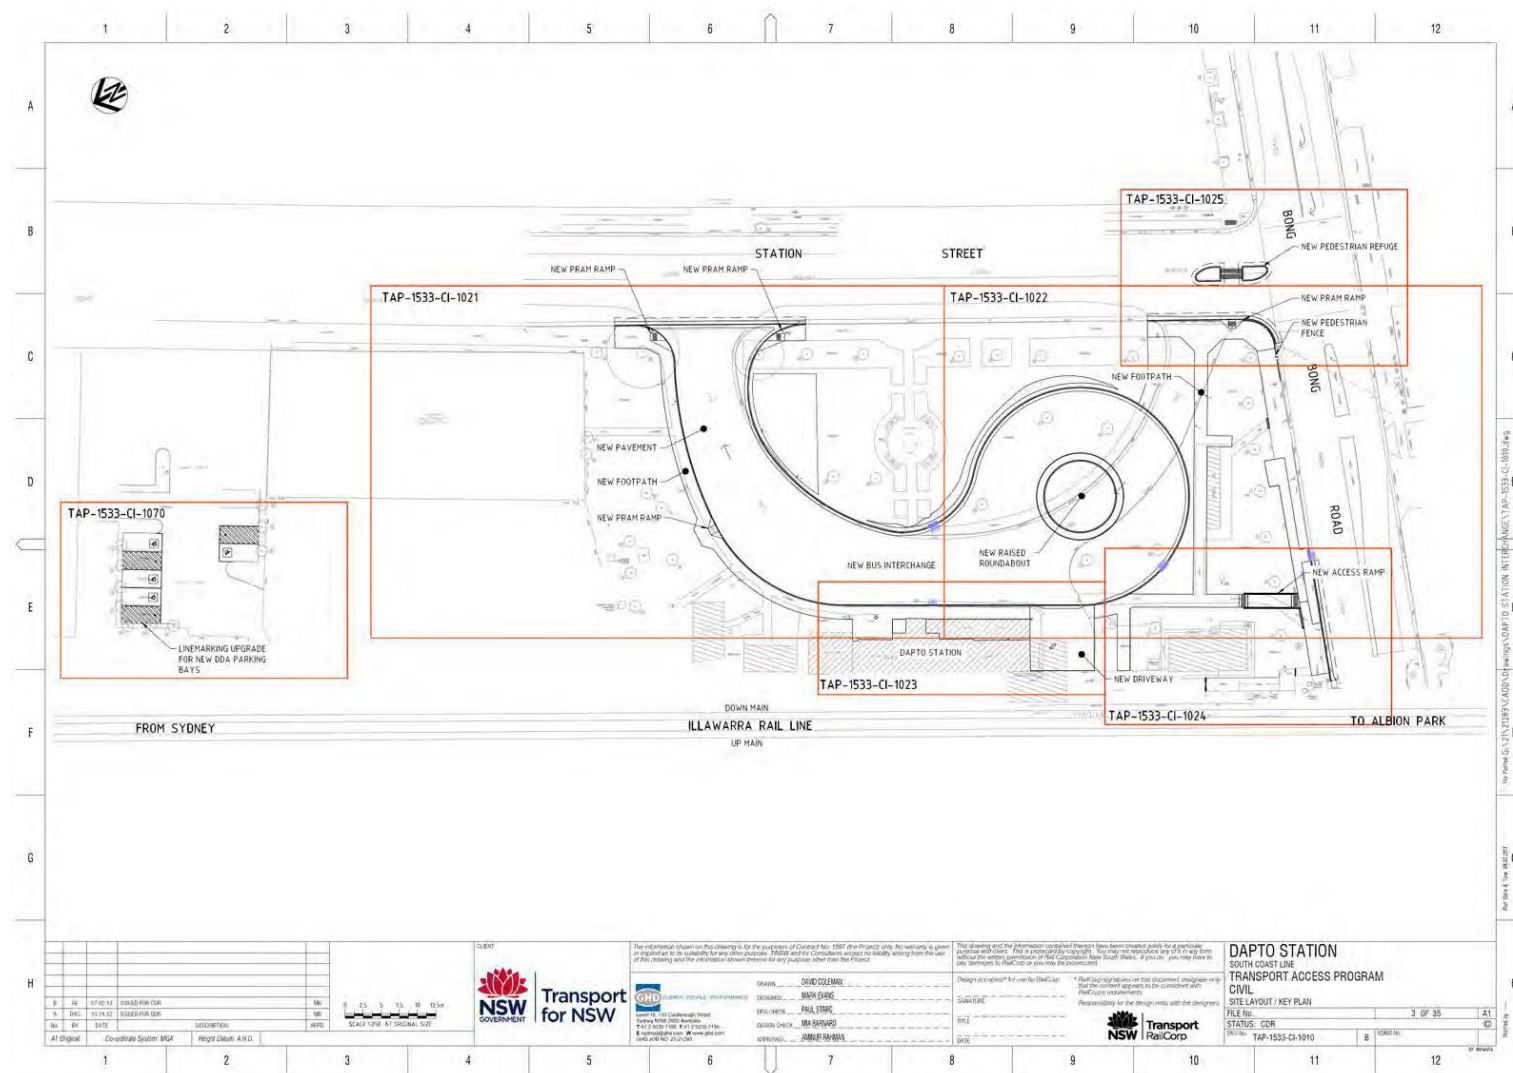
Dapto Station Transport Access Program: Civil Works Site Layout Plan, showing a new bus and vehicle turnaround access road at the main entrance to the station (Source: TfNSW, TAP-1533-CI-1010).
